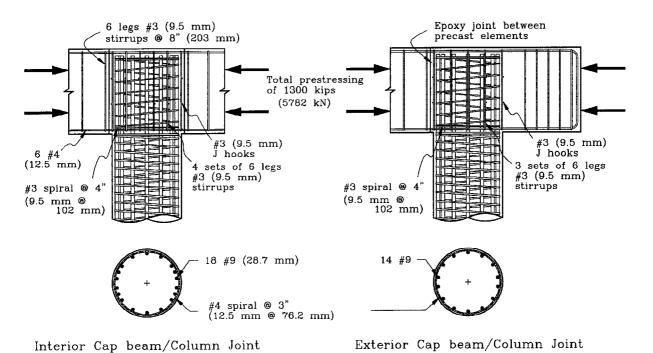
Reinforcement details for the Multi-Column Bridge Bent Unit.
